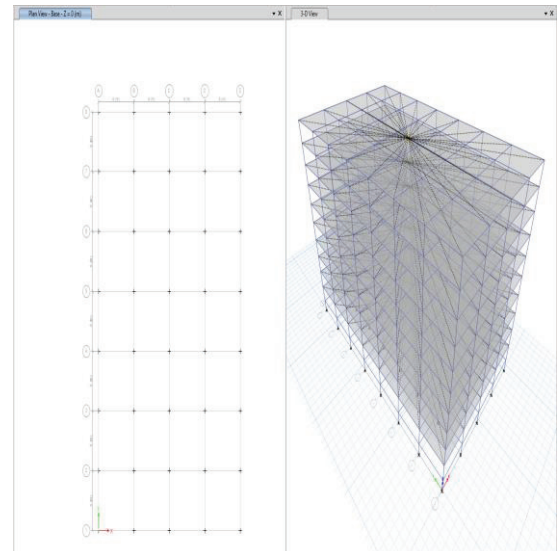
Plan and Isometric view of Model-1 with LRB G+10
